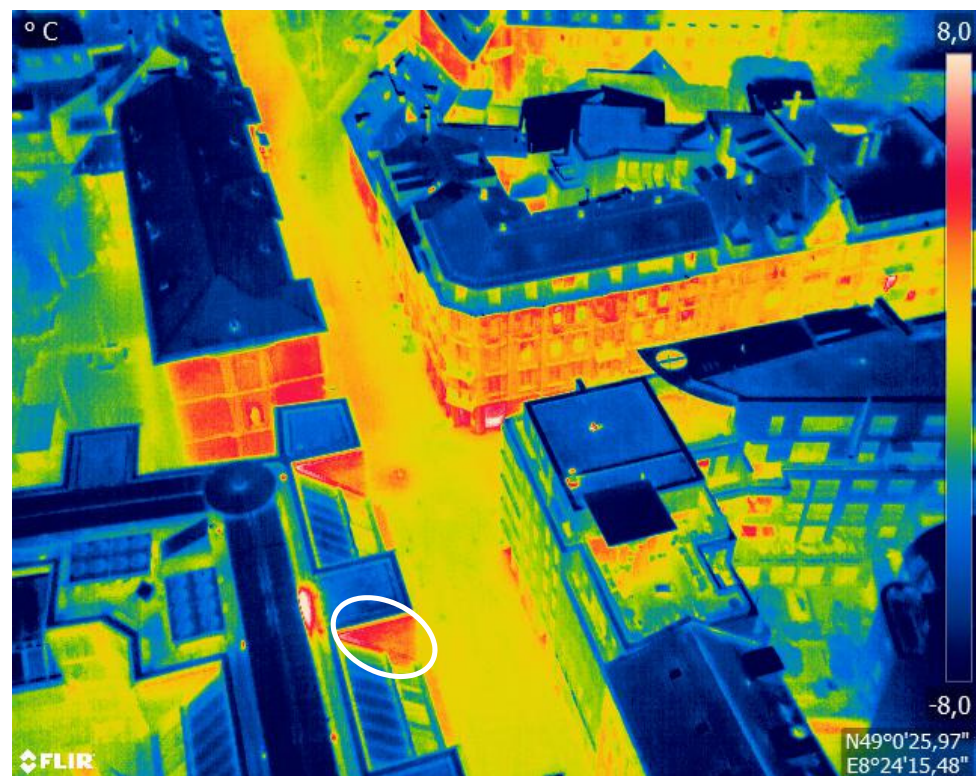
Example: thermal bridge of a connection between a wall and a rooftop.
